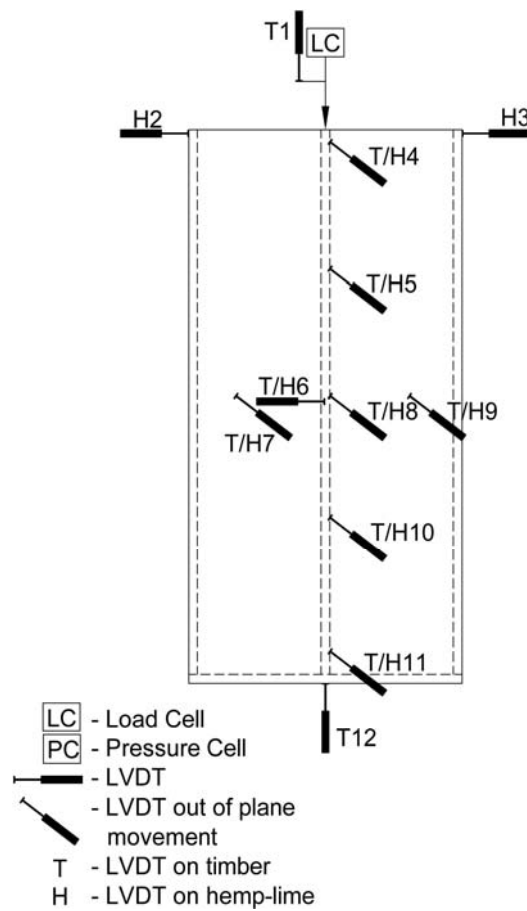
Walls C4 to C7 LVDT and load cell locations
